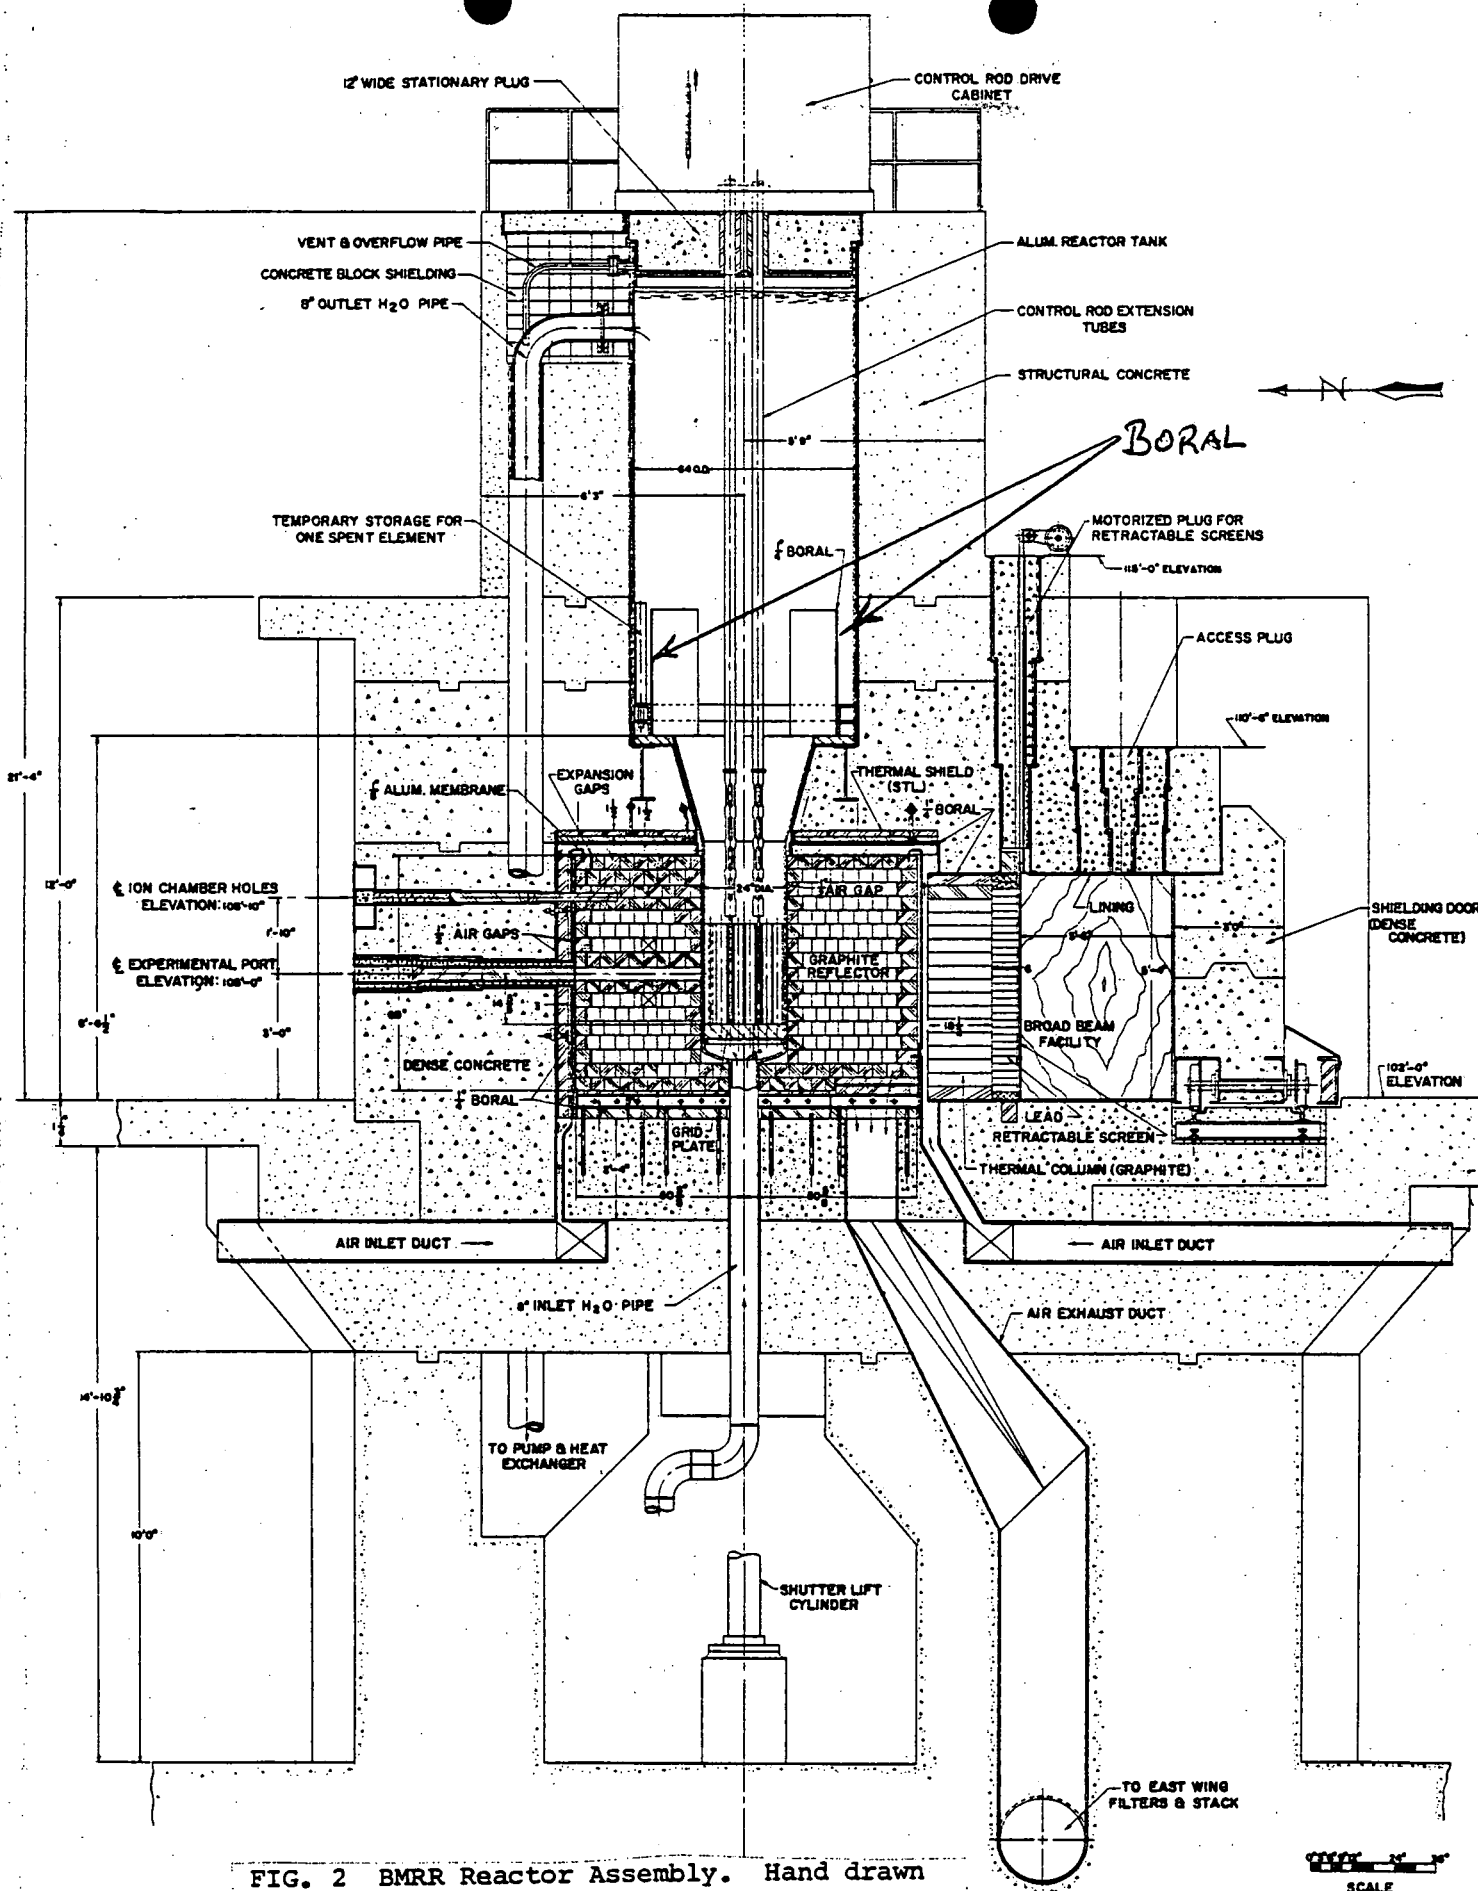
BMRR Reactor Assembly. Hand drawn arrows indicate exposed Boral Sheets. From BNL-600.
